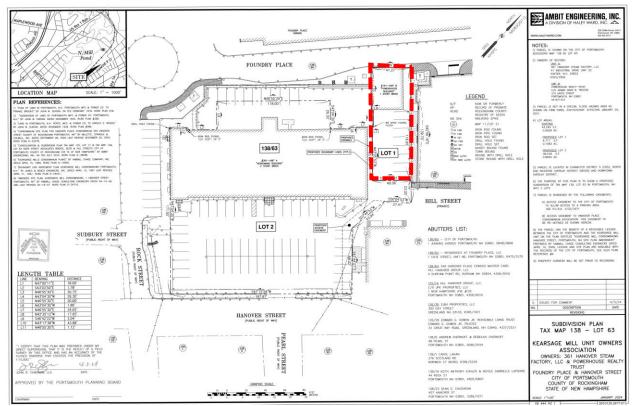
Proposed Subdivision Plan for the Powerhouse Building/"Adams" Parcel (4,717 SF)
